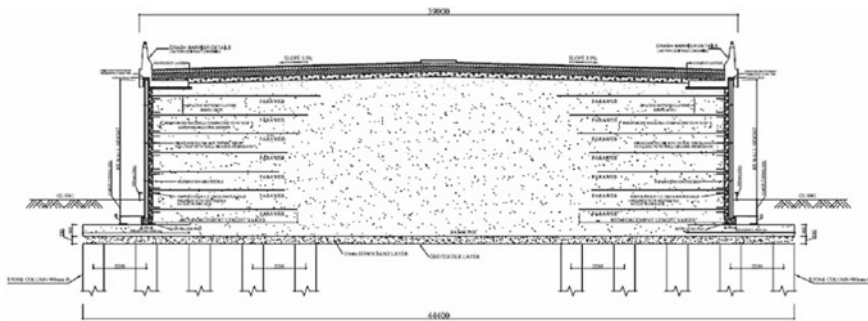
Typical cross section of reinforced soil wall for high strength geogrid laying
